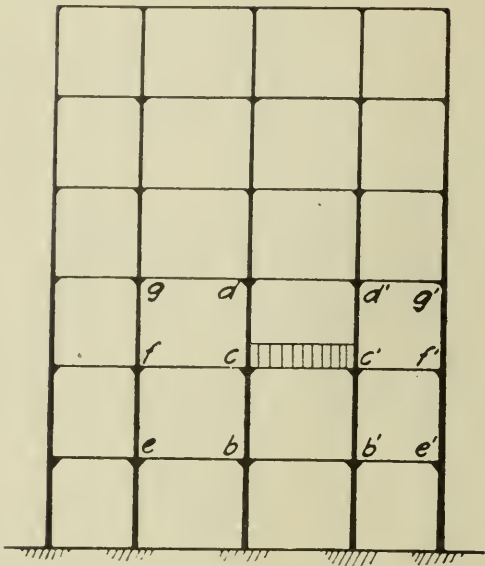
CROSS-SECTION OF BUILDING FRAME WITH SINGLE PANEL LOADED
